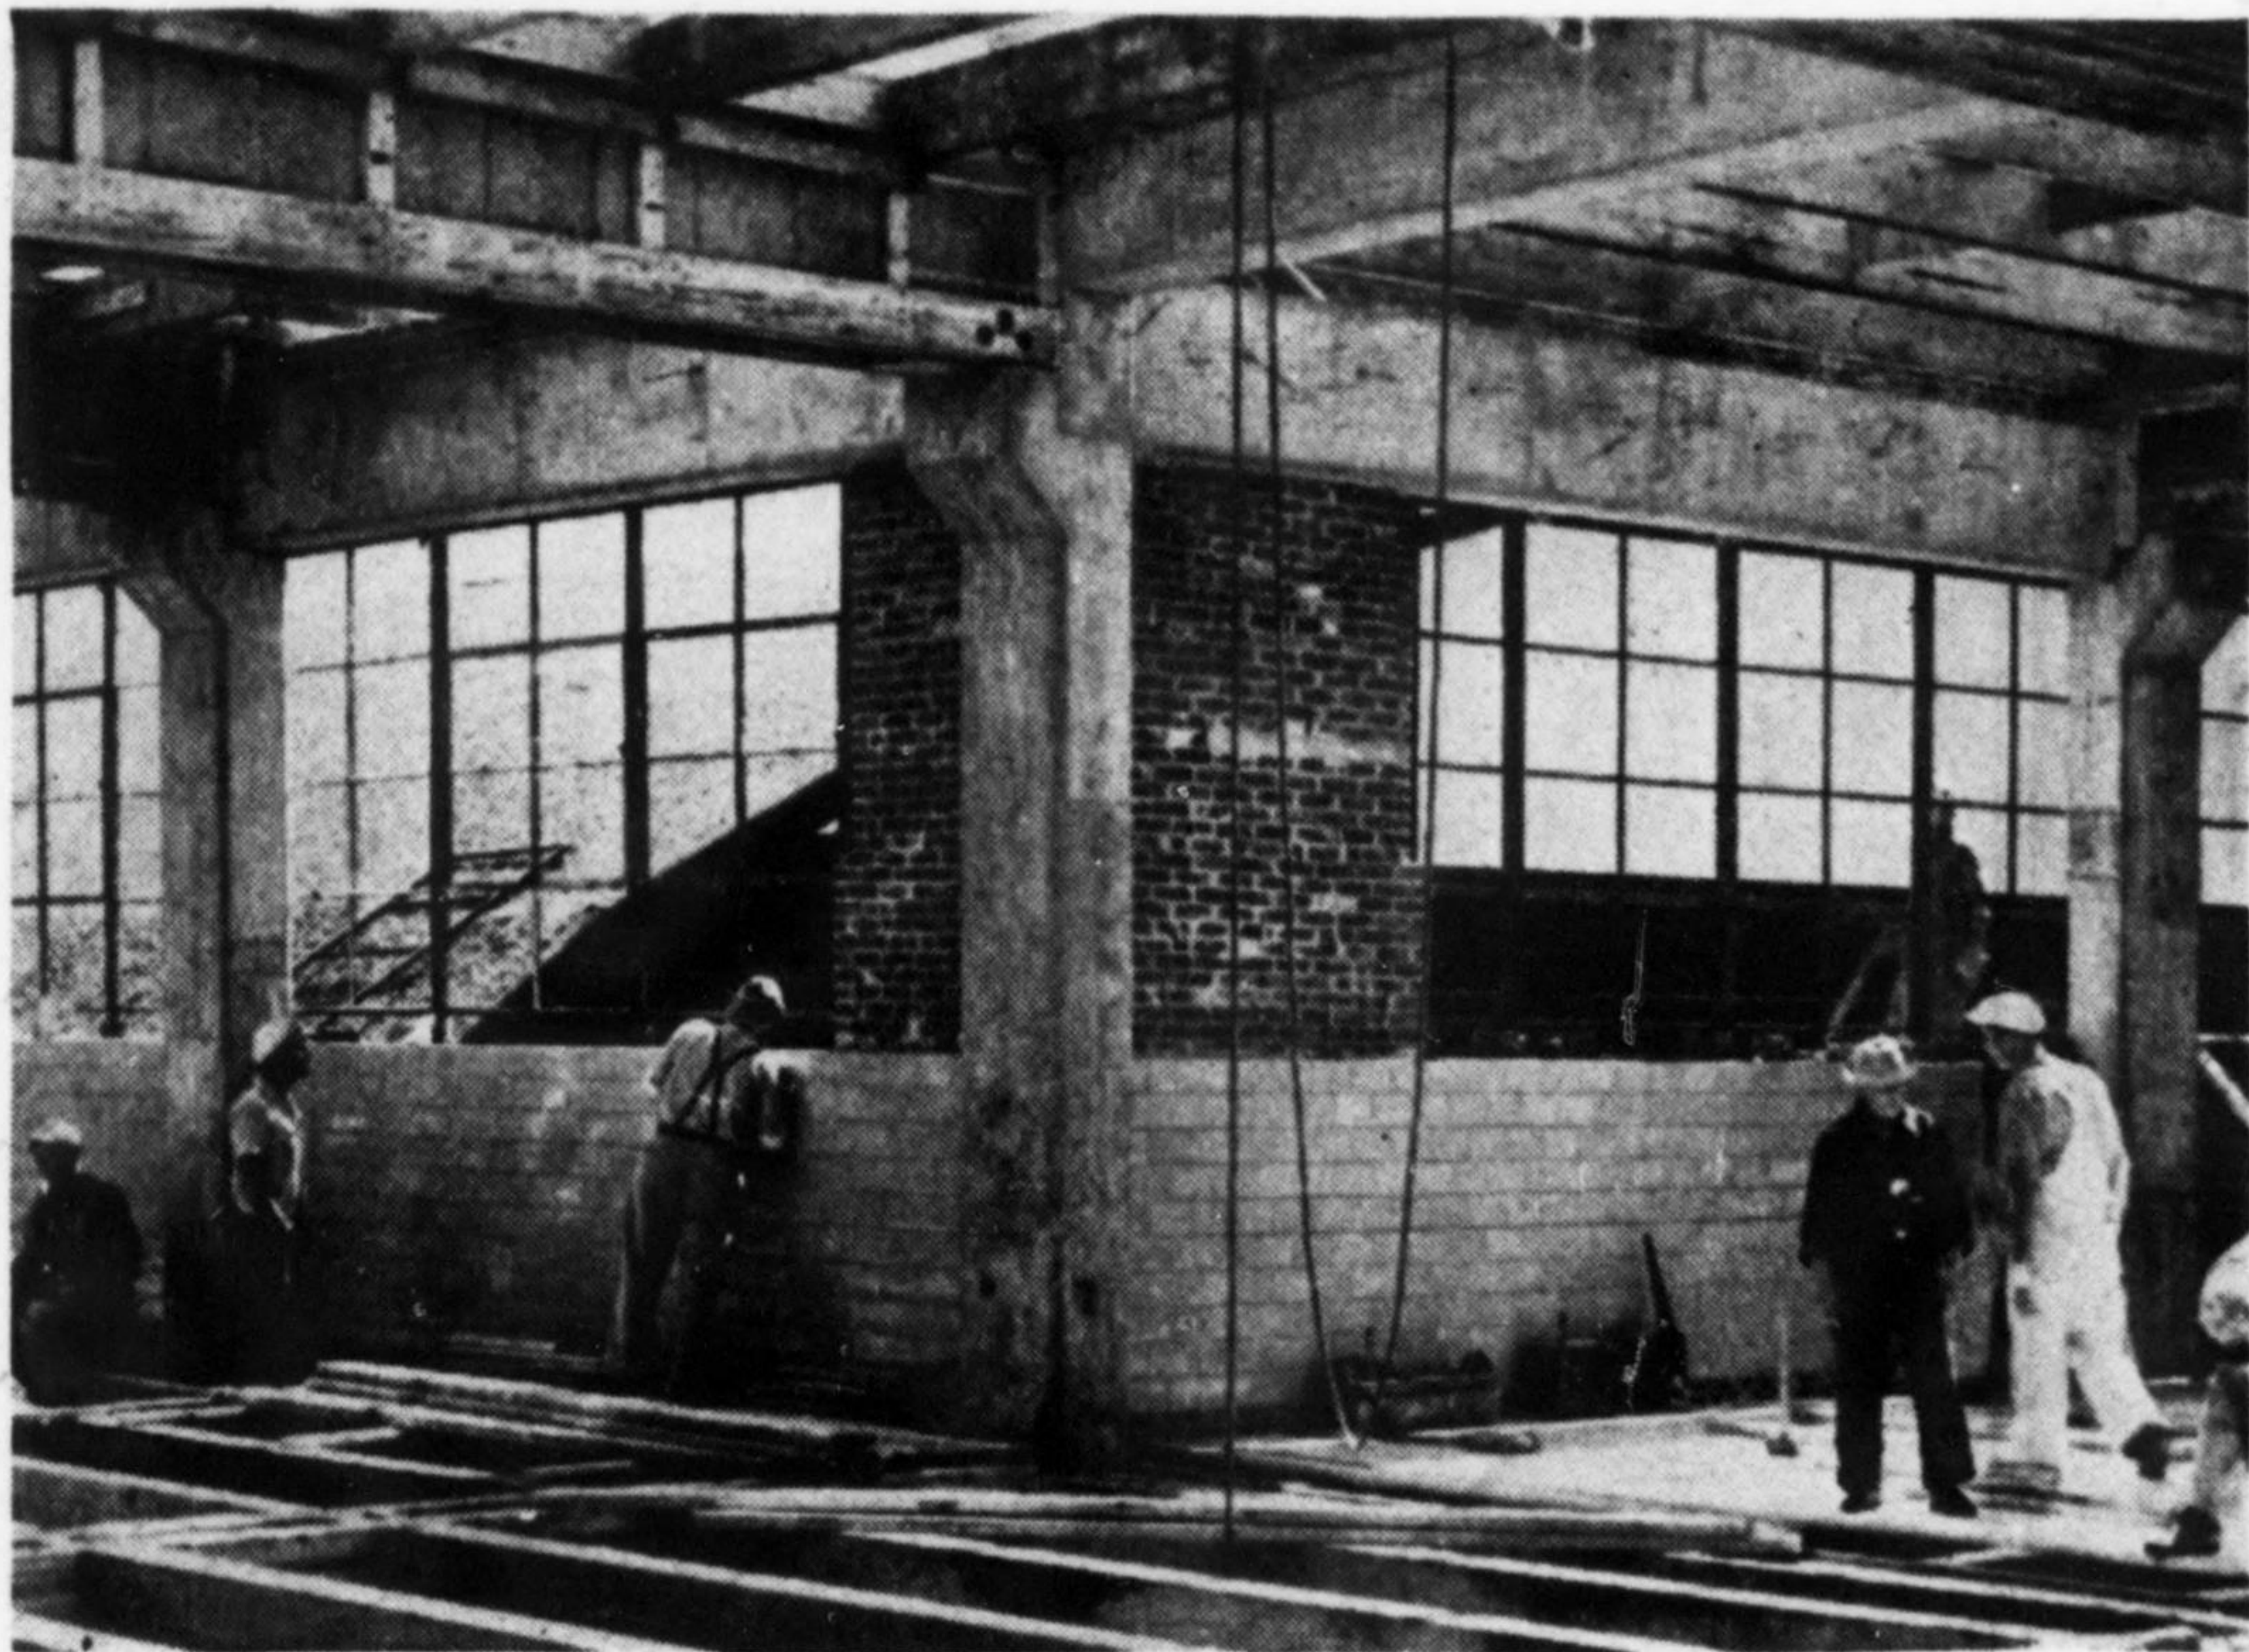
Plywood girders, supporting the second floor and roof of the office building, are rigidly connected to cast-in-place concrete columns. Concrete beams support brick spandrel walls containing steel sash.
